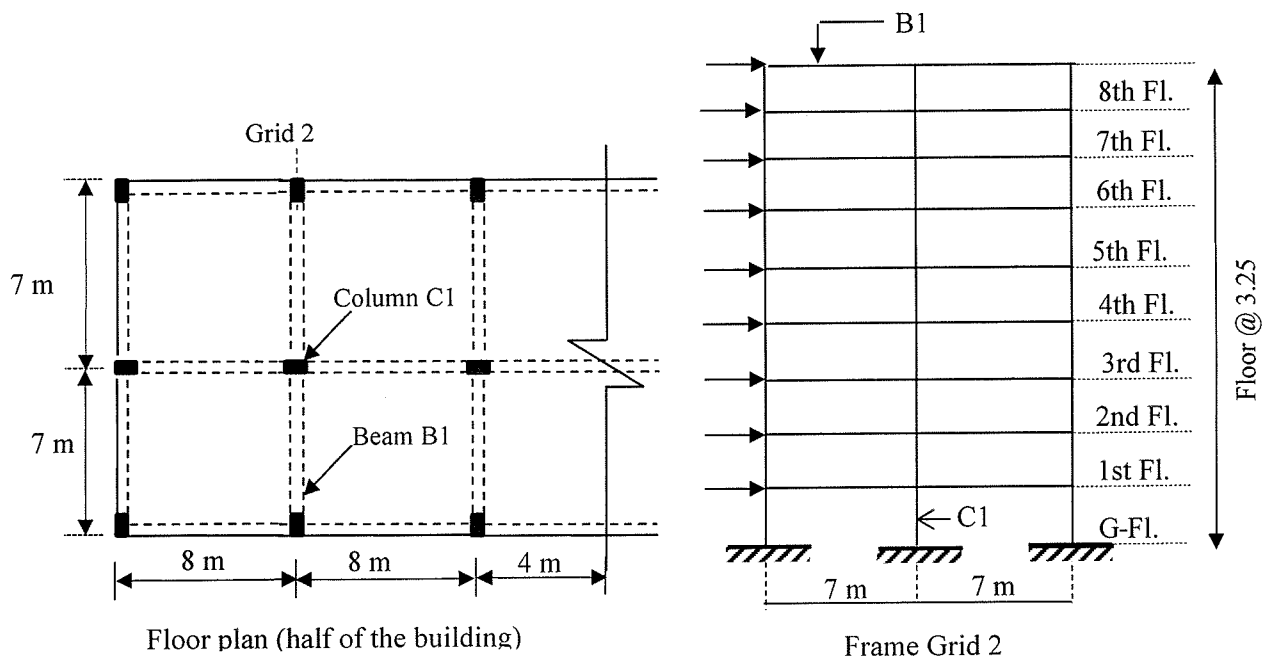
Floor Layout Plan and elevation of 9 Storeyed Apartment
